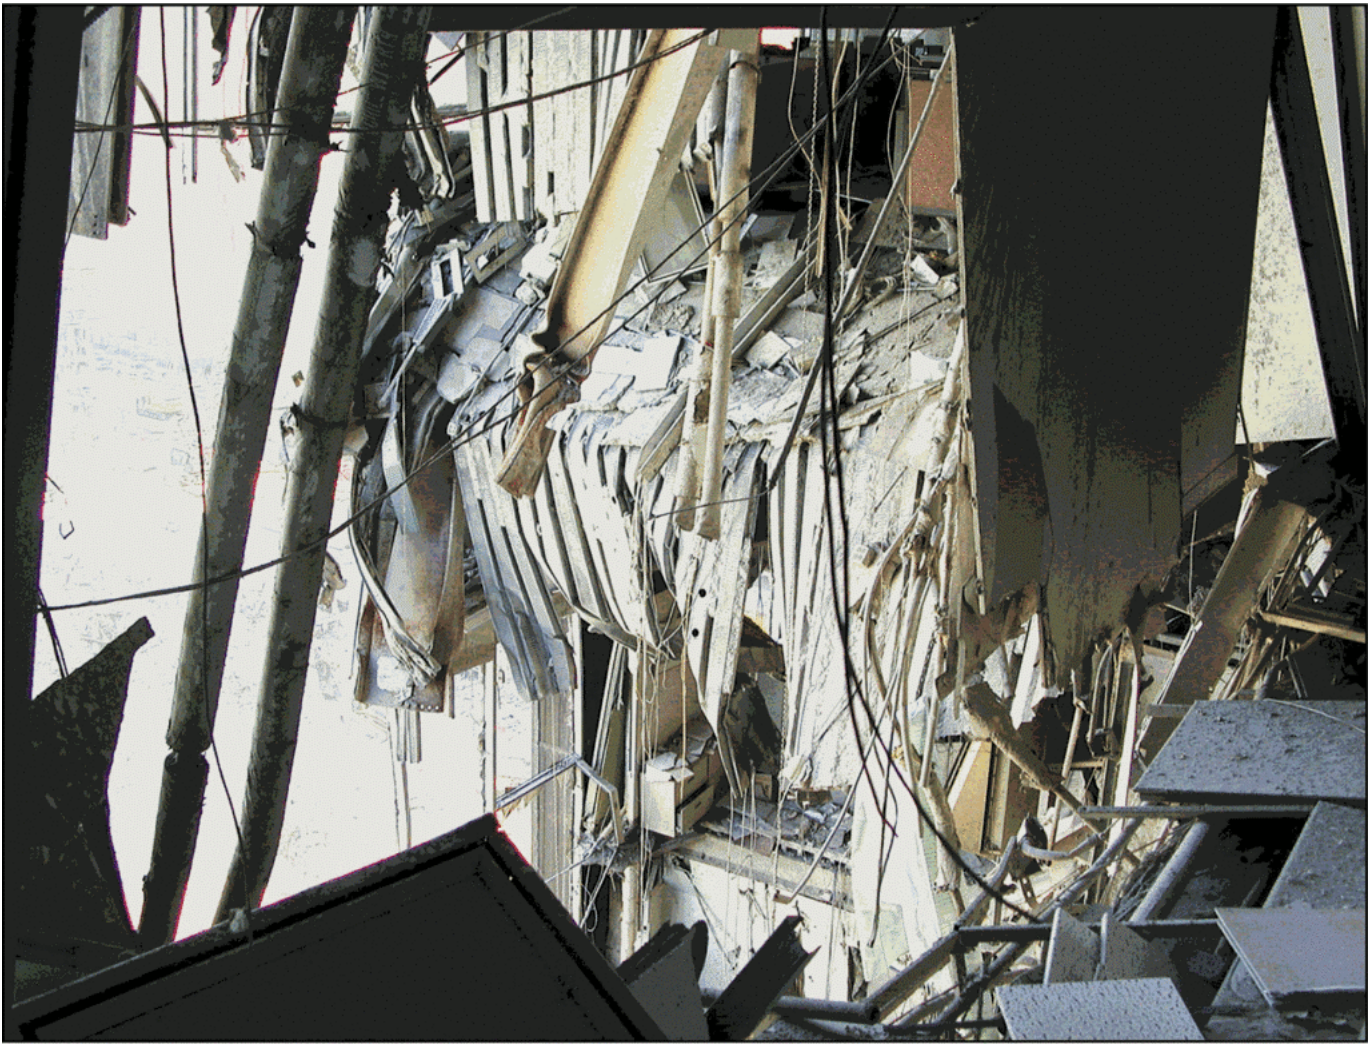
Area of collapsed floor slab in bays between C-8, E-8, C-7, and E-7, from the 15th floor.
